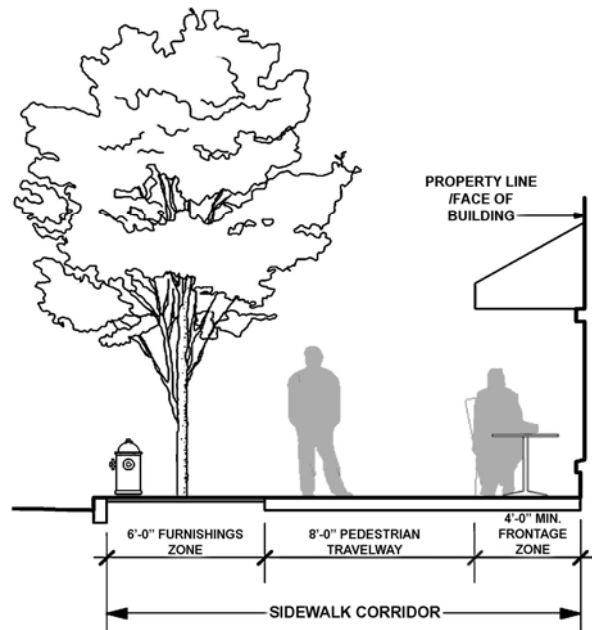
Sidewalk Corridor Zones for Arterial Streets
